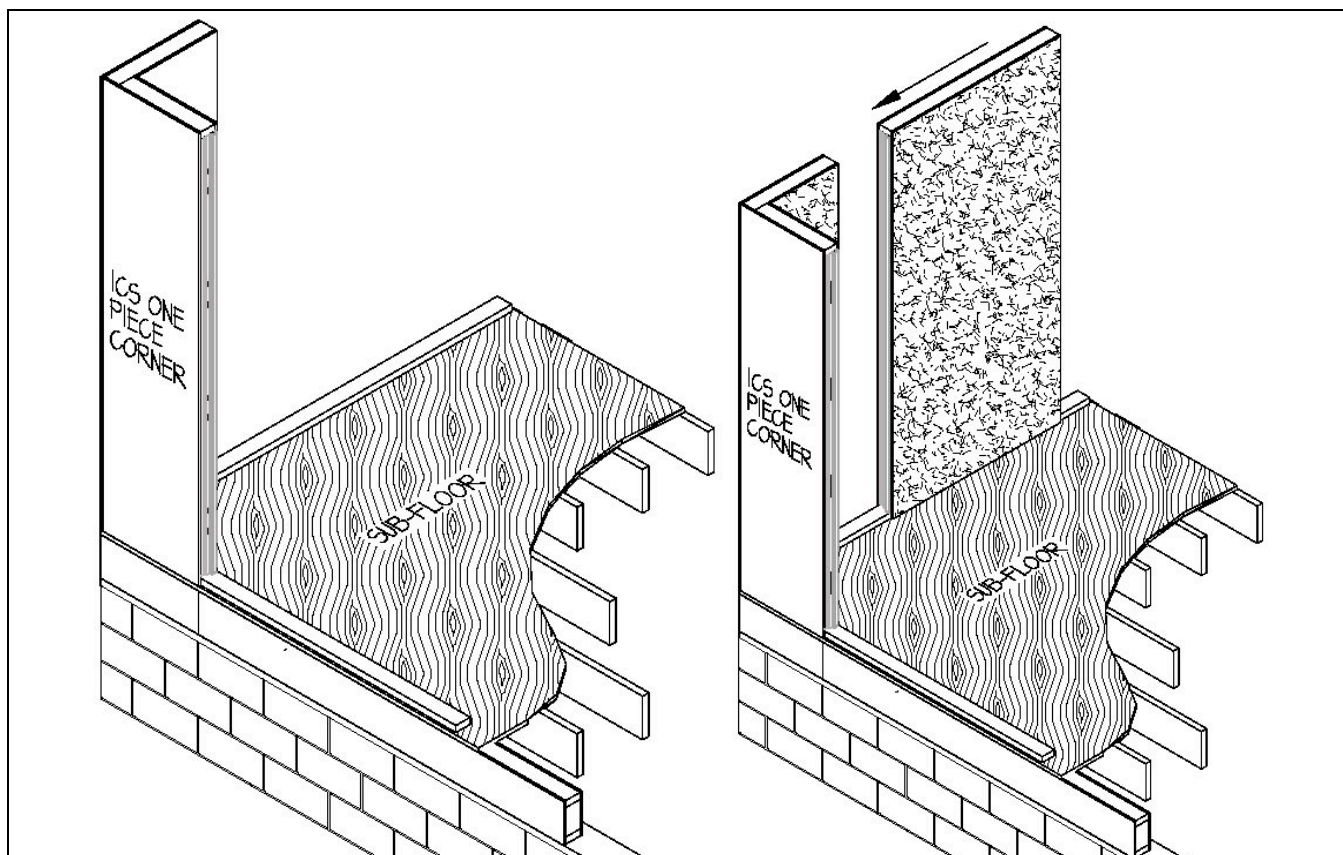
Panel layout for First Wall: Lay panels out on deck. Seal with expanding foam (Handi Foam or equivalent) at sill-plate-to-panel interface and at panel-to-panel interface.
